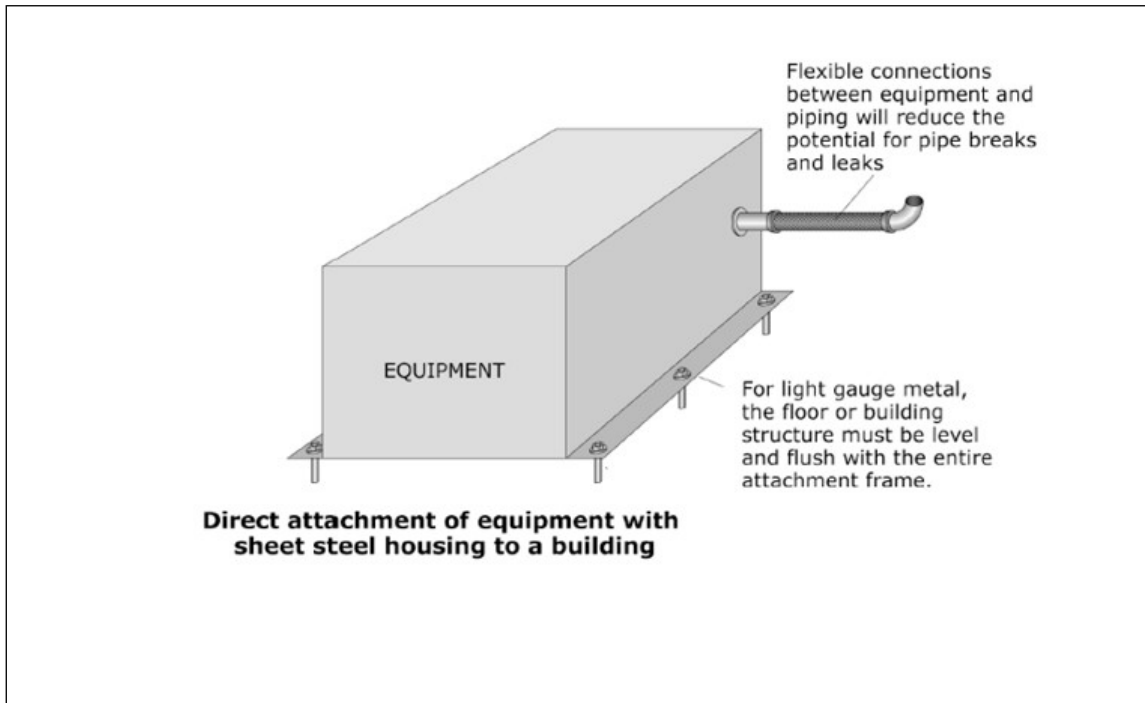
A Example of equipment attached directly through existing base plate to structural floor (Figure 6.4.1.1-6 from FEMA E-74)
